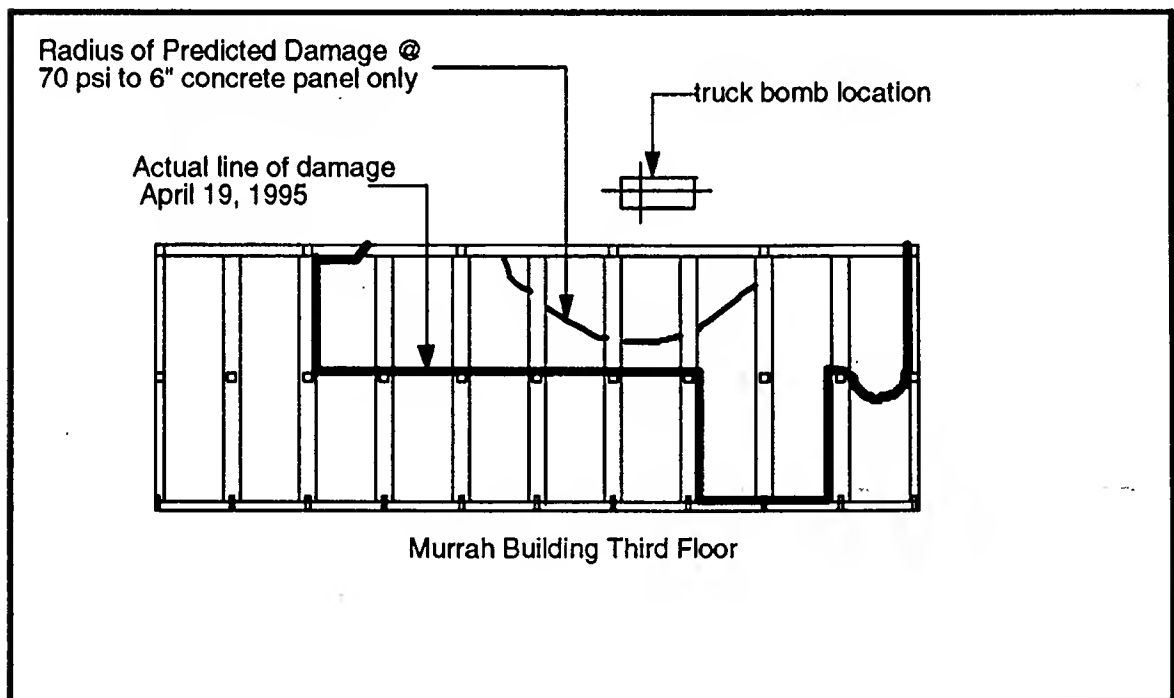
Floor plan showing maximum predicted damage to third floor and the actual line of damage experienced on April 19, 1995.
